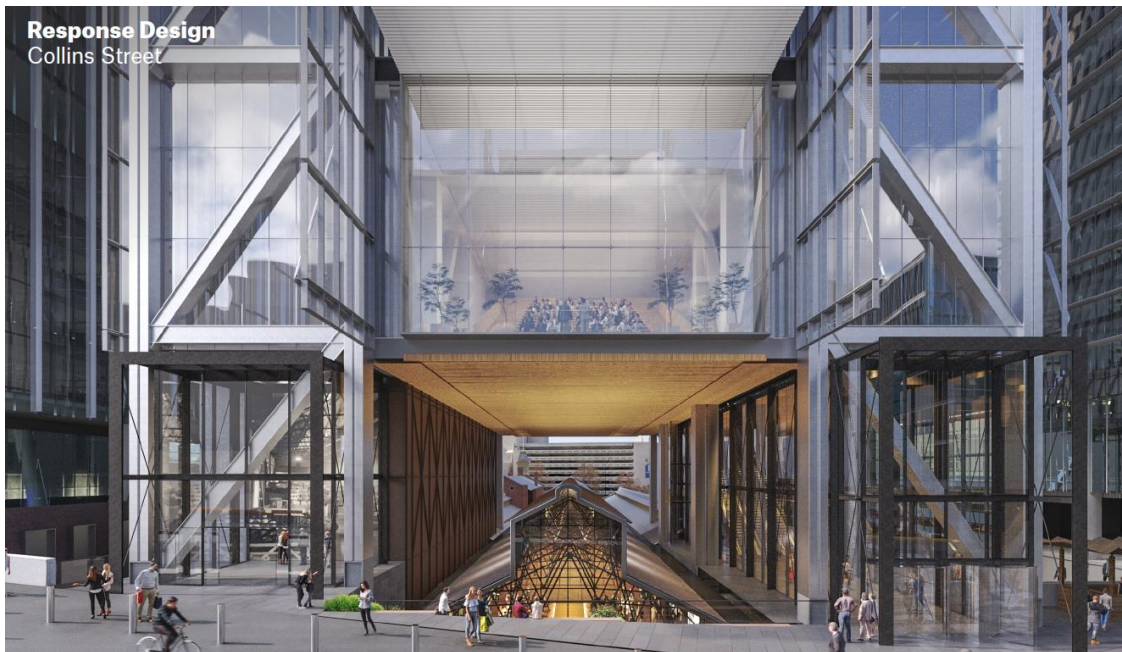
Proposed perspective image of southern tower street edge from Collins Street
